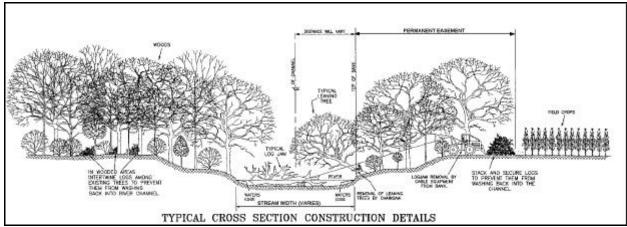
Typical Cross-Section Construction Detail (Source: NRCS Files)
